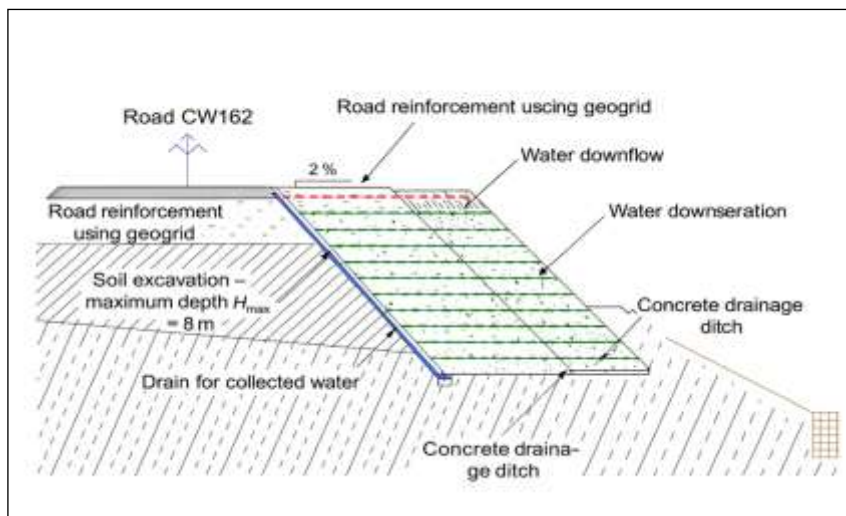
Cross-section of reinforced slope on Road CW162 with geogrid layers and drainage system.
